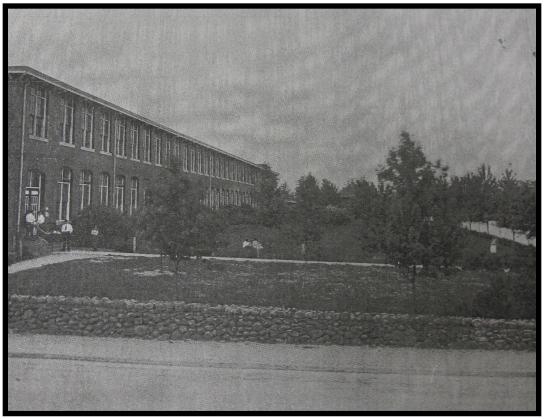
Historic Photograph Showing the Original Mill and the Stone Retaining Wall on the North Side of Sixth (now Eight) Street, Looking Northwest (The Erlanger Company 1921).
